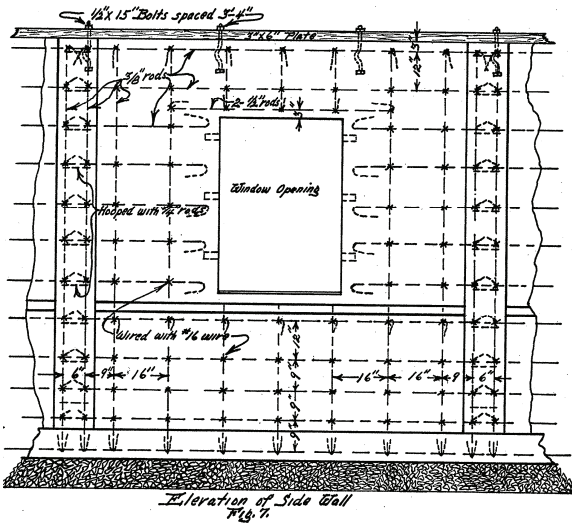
Close-up side wall elevation from 1921 "Boat House Reinforcing & Roof Detail" drawings.
